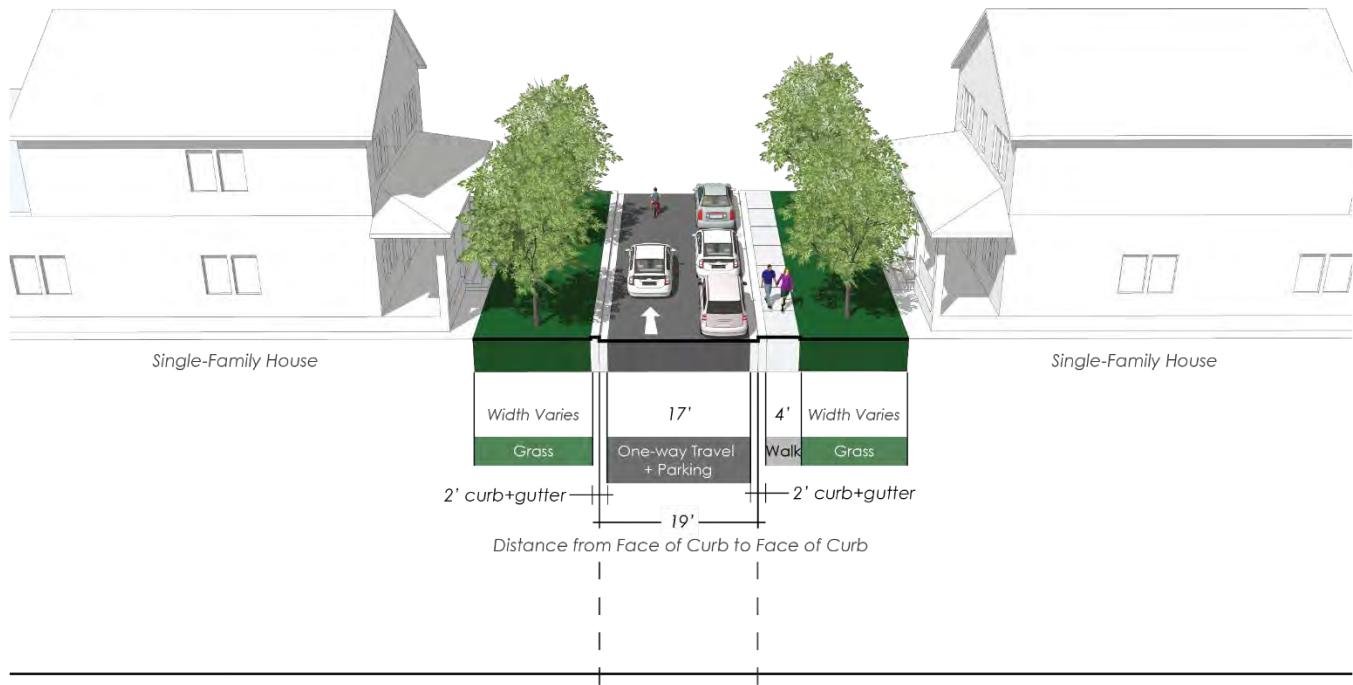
Recommended Typical Section for Sleaford Road (Tilbury Street to Pearl Street)
